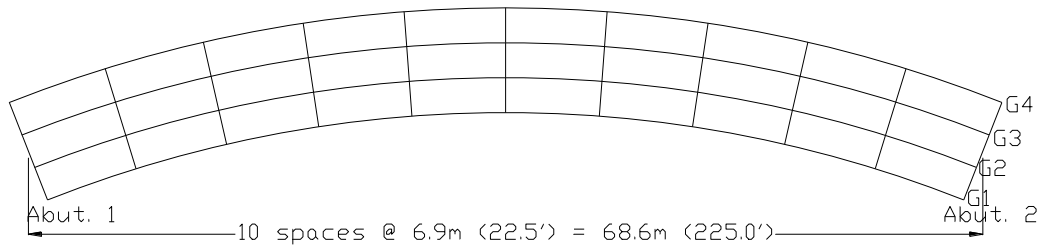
Simplified Framing Plan, Single-Span, 4-Girder, 91-m (300-ft) Radius Bridge, R/L = 13.33.
